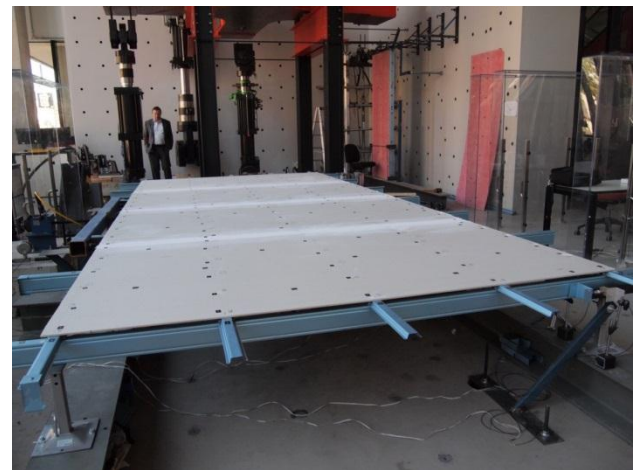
Complete beam test specimen. The dark spots on the plasterboard are reflective photogrammetry target.
